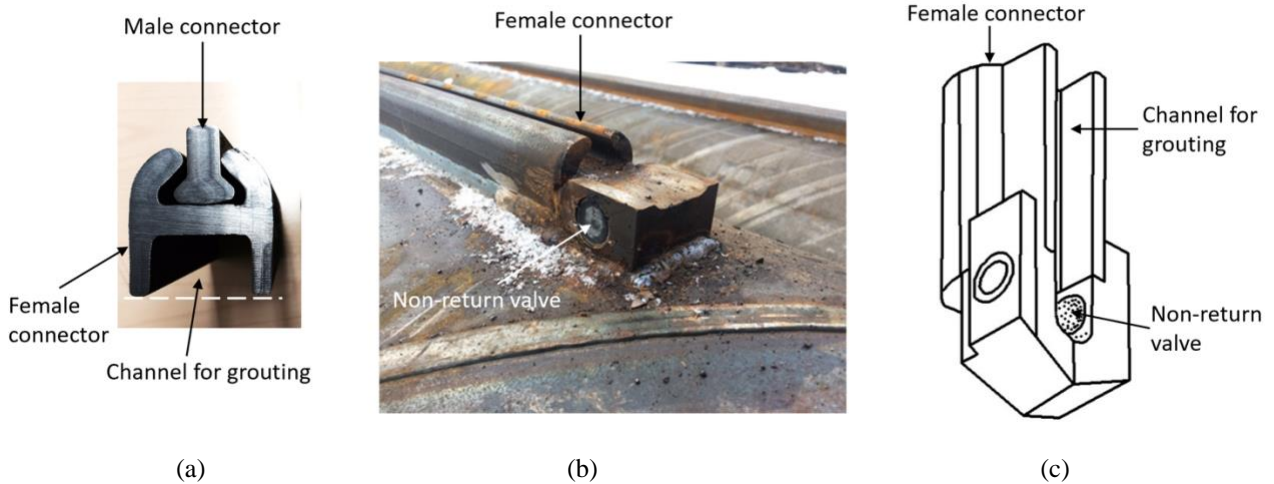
Joint details (a) interlocking joints; (b) Female joint welded onto casing with non-return valve at its end; (c) 3-D diagram of female joint and non-return valve
